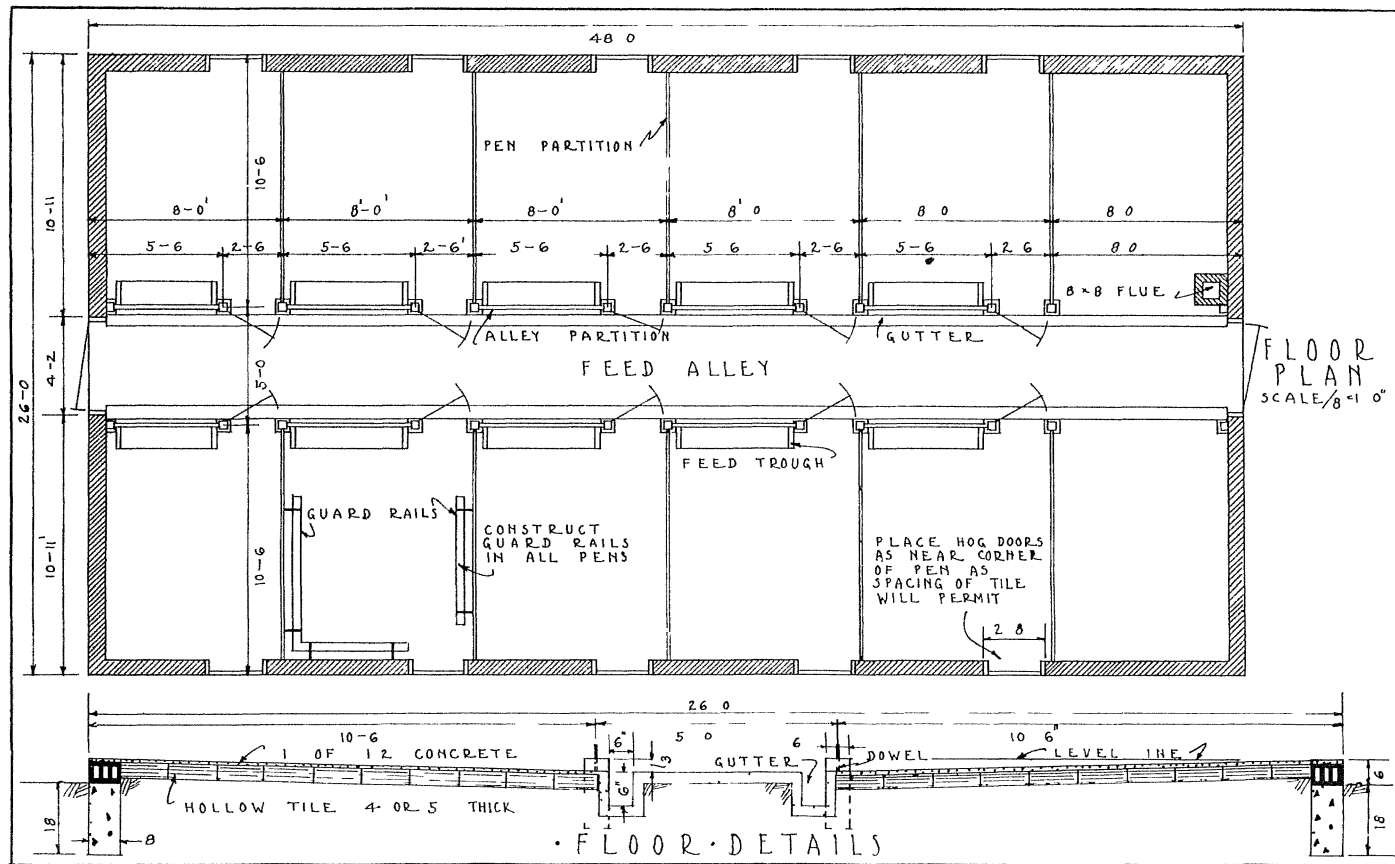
Floor plans for a house of hollow tile construction with 8' x 10' pens and 5 foot central alley Add this sheet to Fig 11 to make a complete set of drawings
